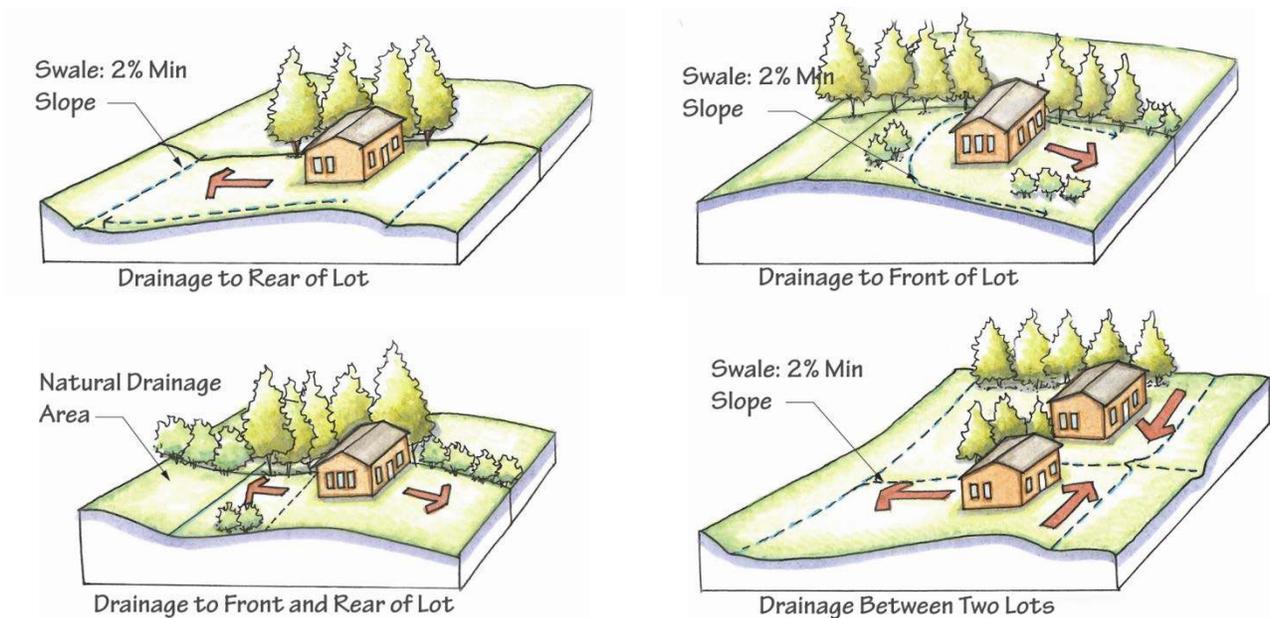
A: Illustrations of Lot Drainage and Swales
